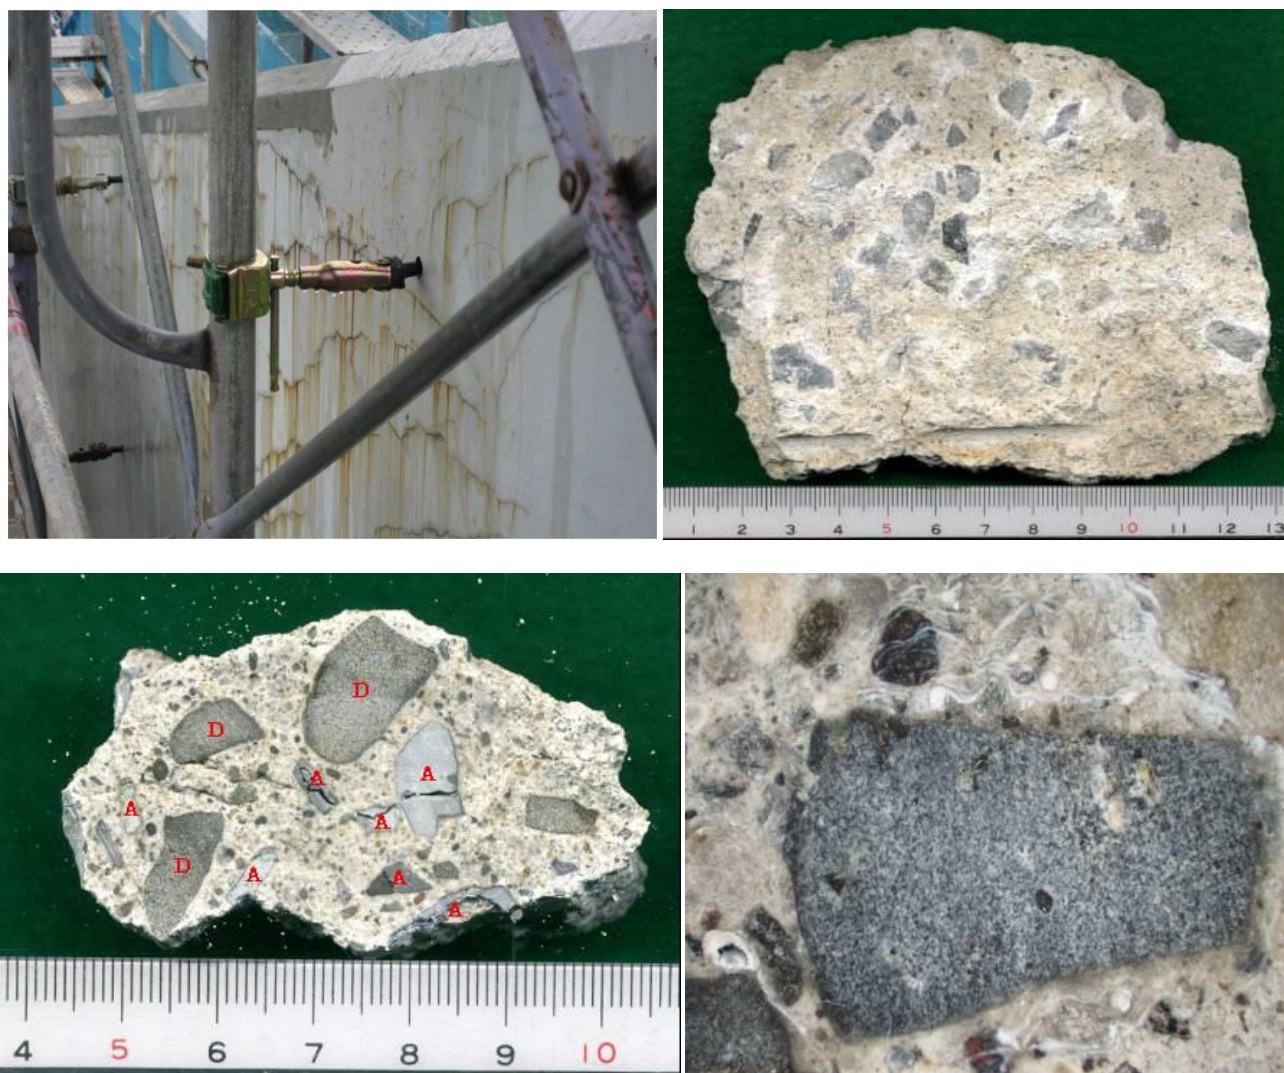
Example of ASR damage by rapid expansive aggregate. Left upper: damaged member having oriented crack pattern in the direction of prestressing. Right upper: damaged concrete taken from the structure indicating white “ASR gel” residues surrounding reactive aggregate. Left lower: Cut surface of damaged concrete where cracks pass through and connecting reacted aggregate labeled as “A”. A: Andesite, D: Dolerite. Right lower: Extruded viscous ASR gel from reacted aggregate.
